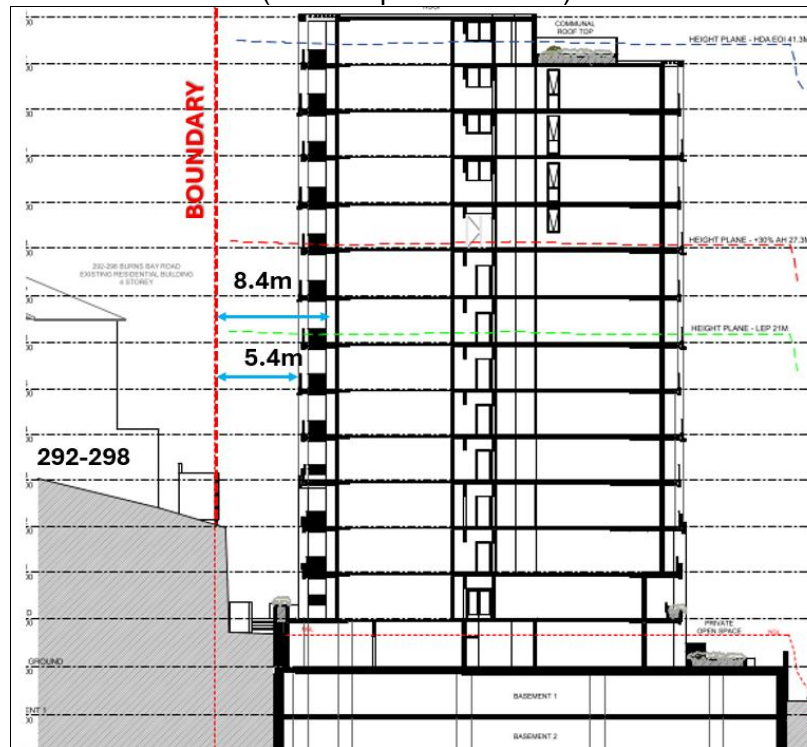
A: Section showing non-compliant setback of Tower B to northern boundary. (Source: pbd architects)
